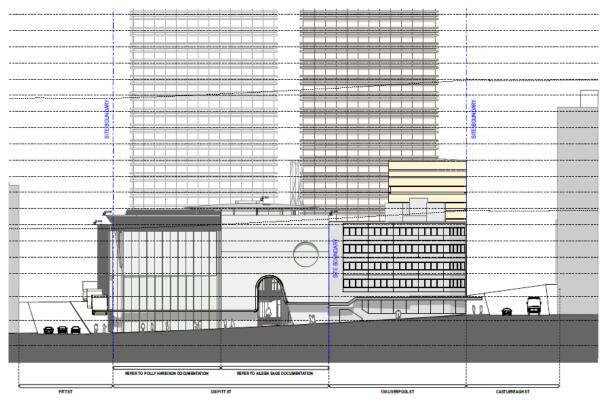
Extract of proposed plans– proposed Liverpool Street elevation at podium level
